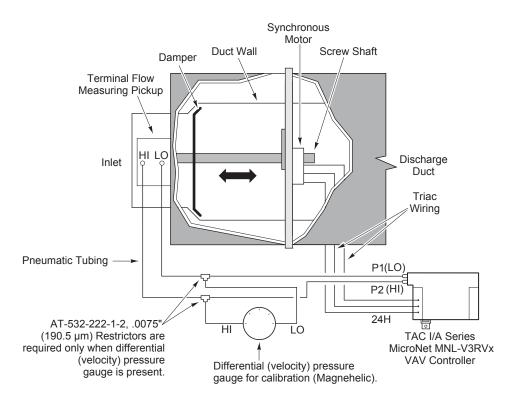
Internal View of VAV Terminal Box with Triac Driven Synchronous Motor and Pneumatic Tubing Detail.
